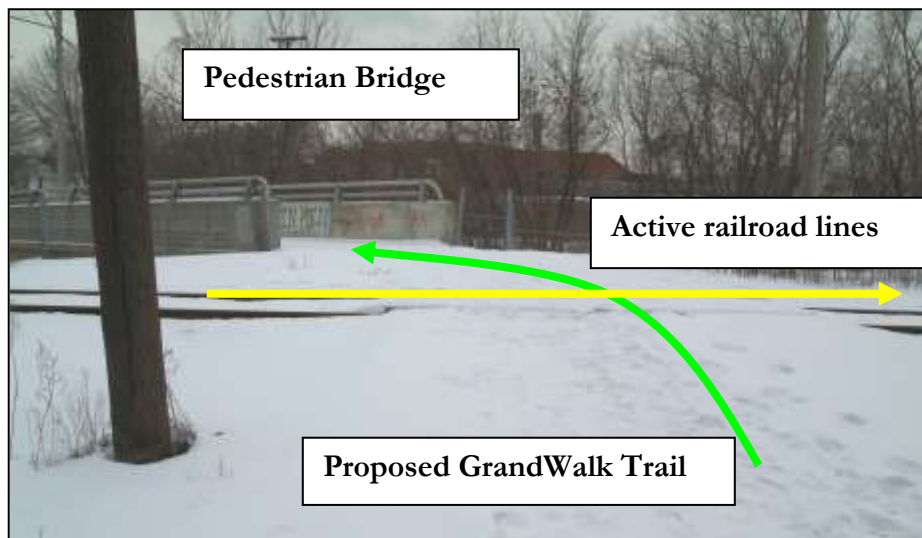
Proposed GrandWalk Trail crossing over the railroad tracks to the pedestrian bridge
